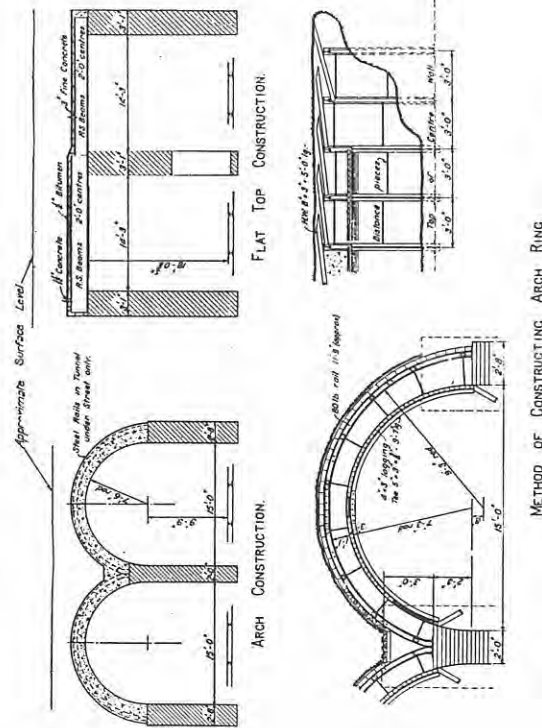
Twin Tunnels between Goulburn Street and Museum Station.
